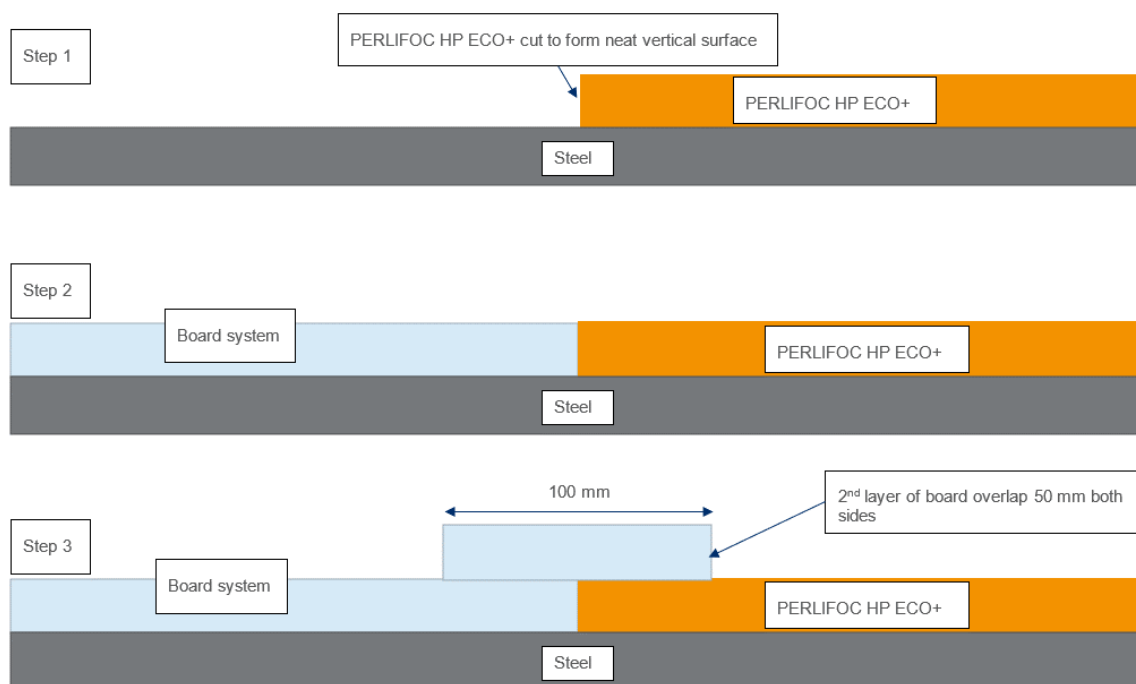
Installing a new board system next to PERLIFOC HP ECO+ protected steel
